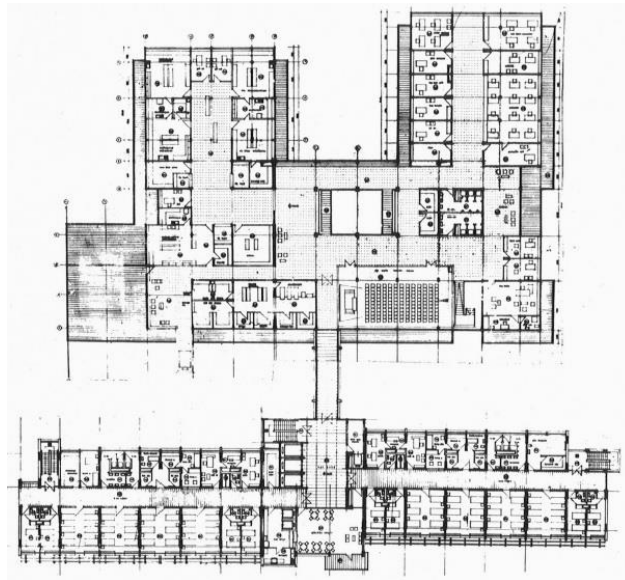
First Floor Plan, Social Insurance Institution Göztepe Hospital
